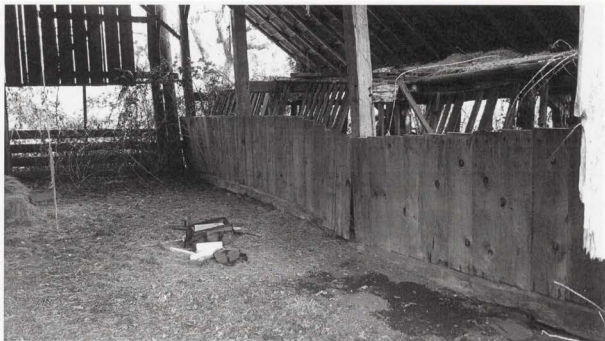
South interior partition, looking southeast. Note remnant sill, improvised hayracks and mow
